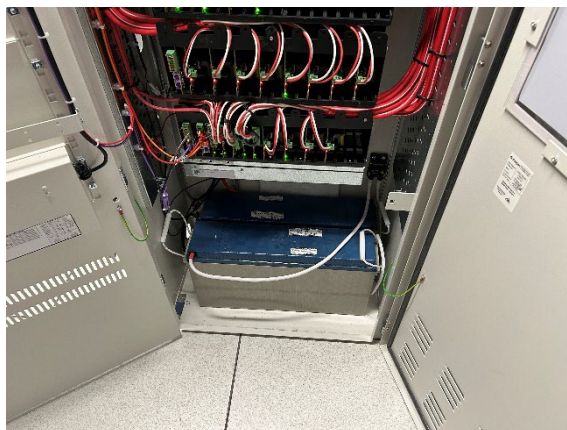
12V Batteries in the Level 10 Electrical Riser Room Control Panel.
